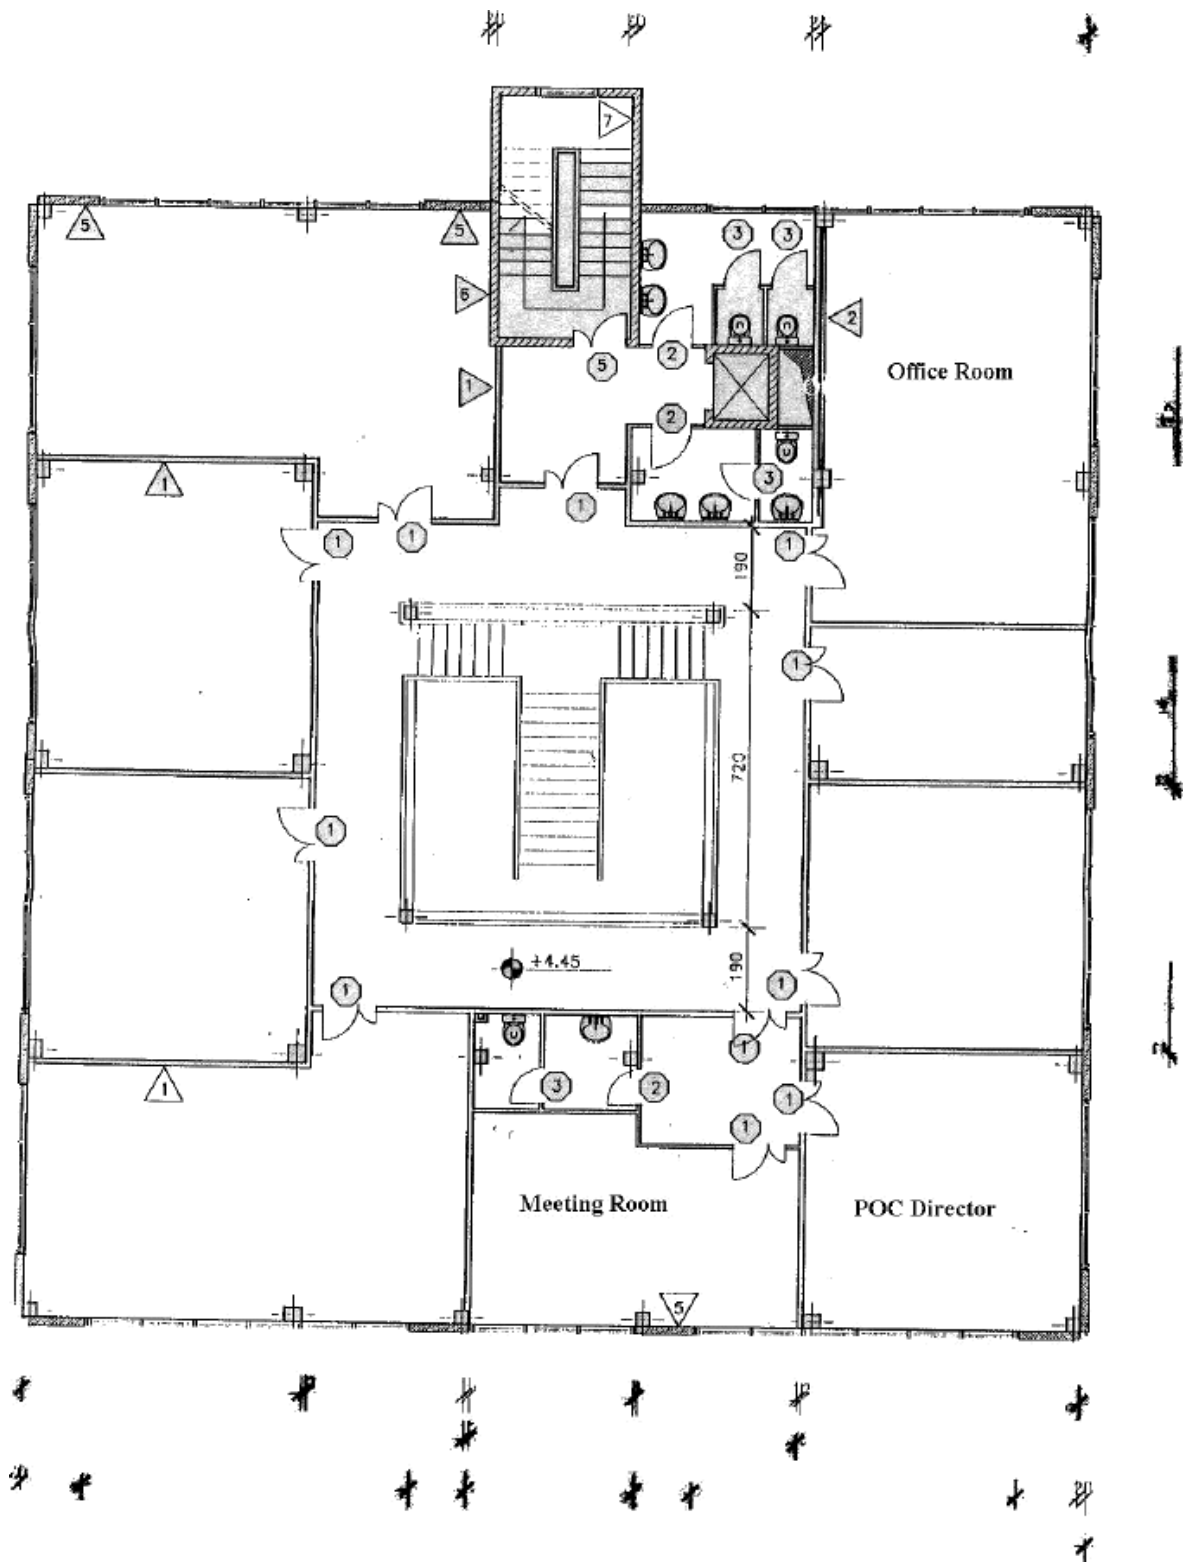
CMR office floor and POC reserved rooms (first floor)
